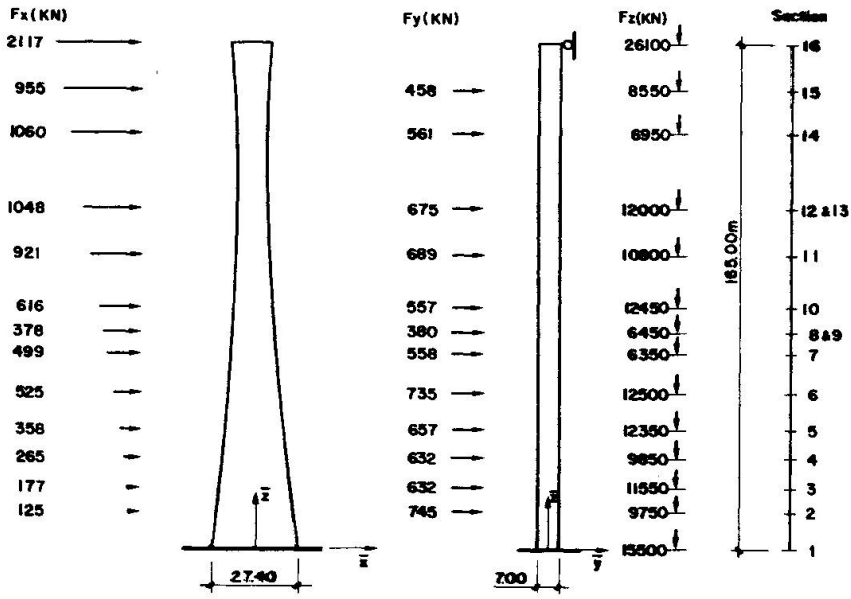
Prestressed tall bridge pier, with discretized design loads and cross-sections [3].
